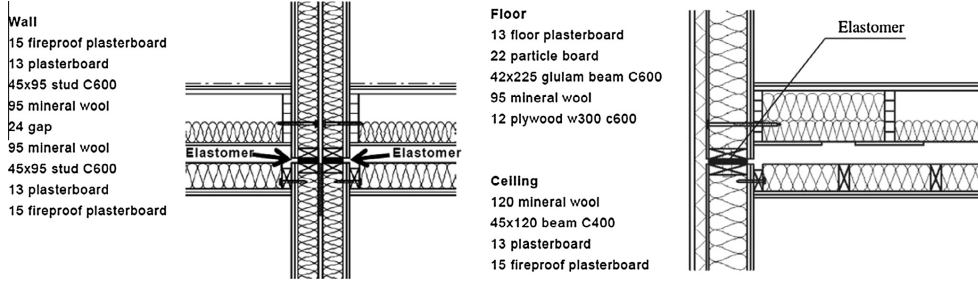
Drawings of the TVE building system, showing sections of the floor and ceiling structures and the junctions with apartment separating wall (left) and façade wall (right).
